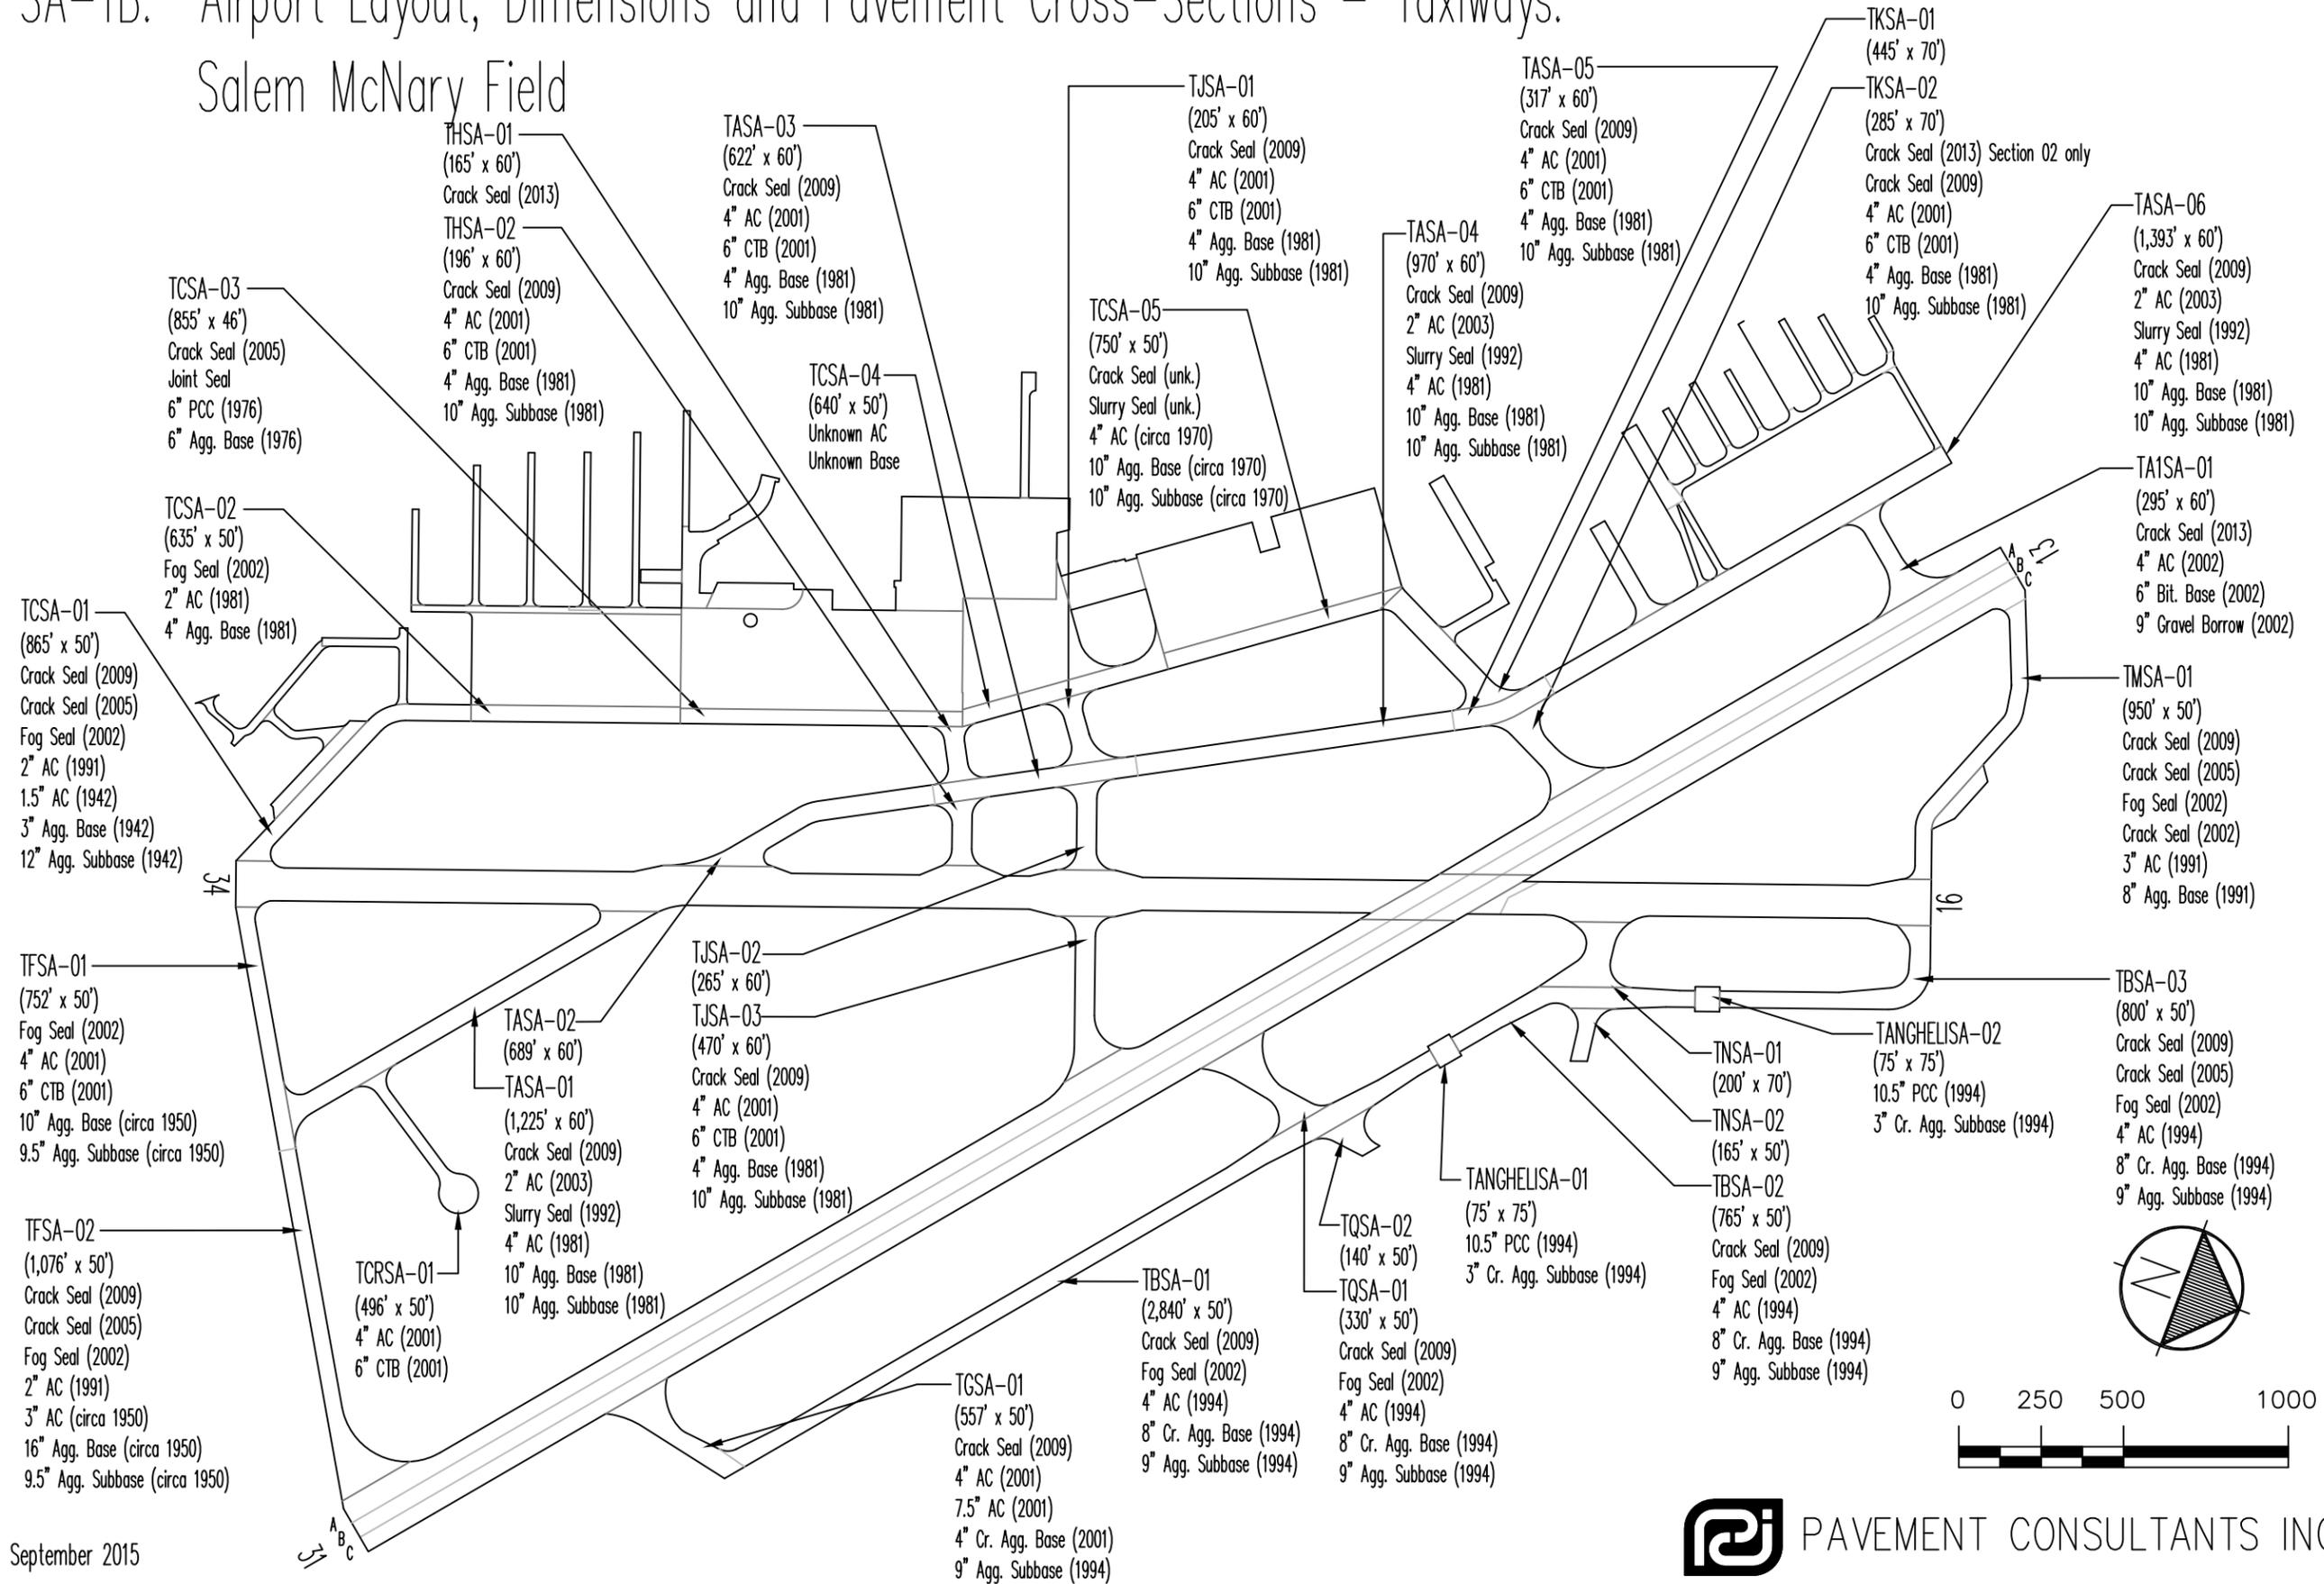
B. Airport Layout, Dimensions and Pavement Cross-Sections – Taxiways.
